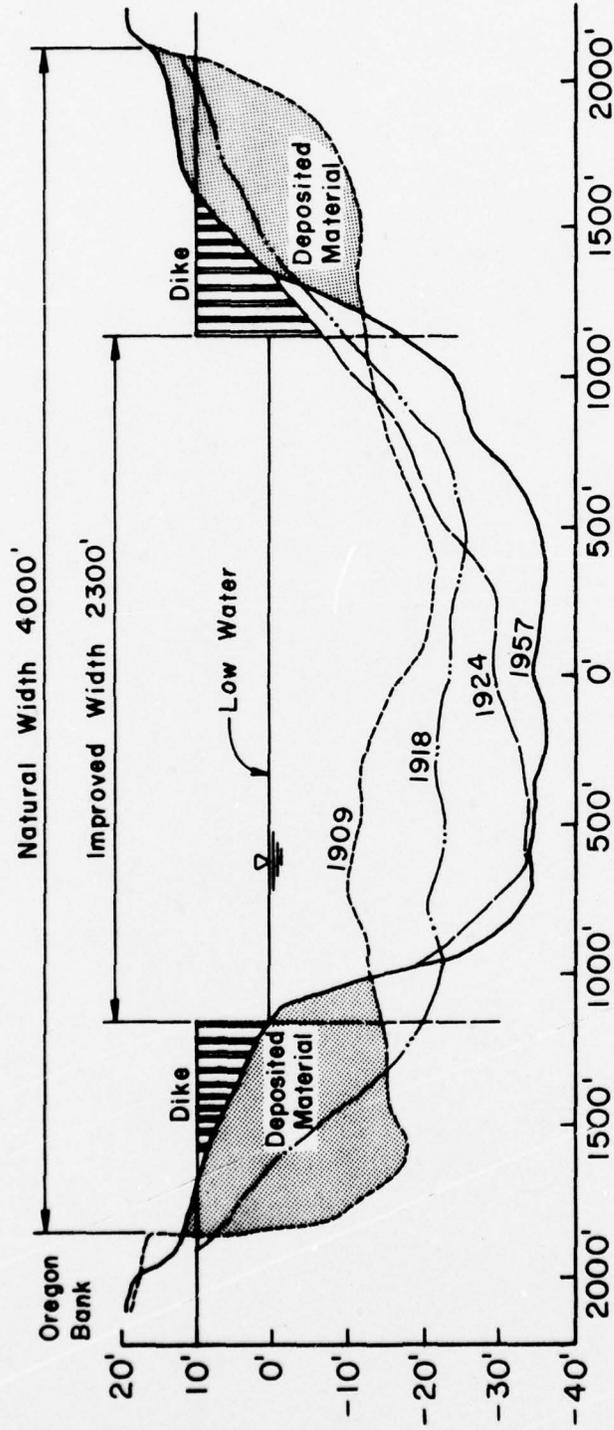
Cross Sections at Henrici Bar, Columbia River (River Mile 91) 1909-1959 (after Bubenik, 1963).
